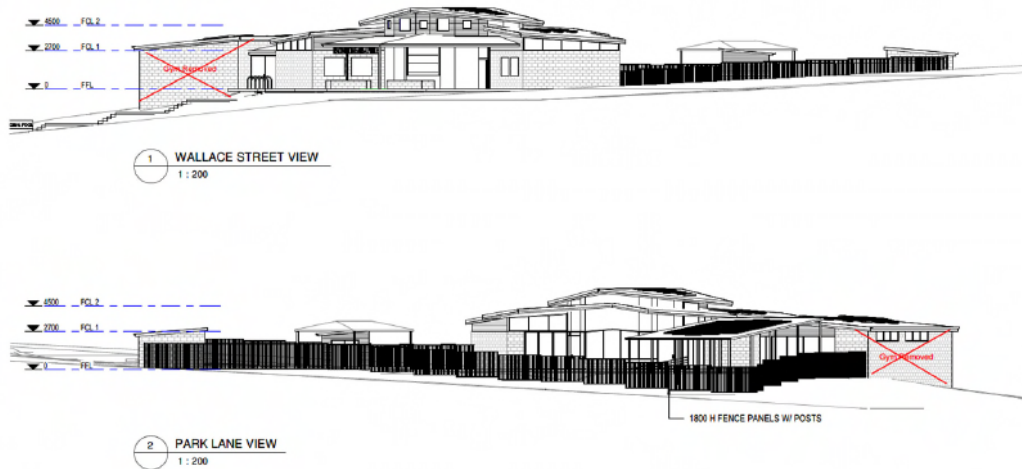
Previously Approved (under DA.2021.1258) External Street Elevations (Prepared by Paul Barnett Design Group)
